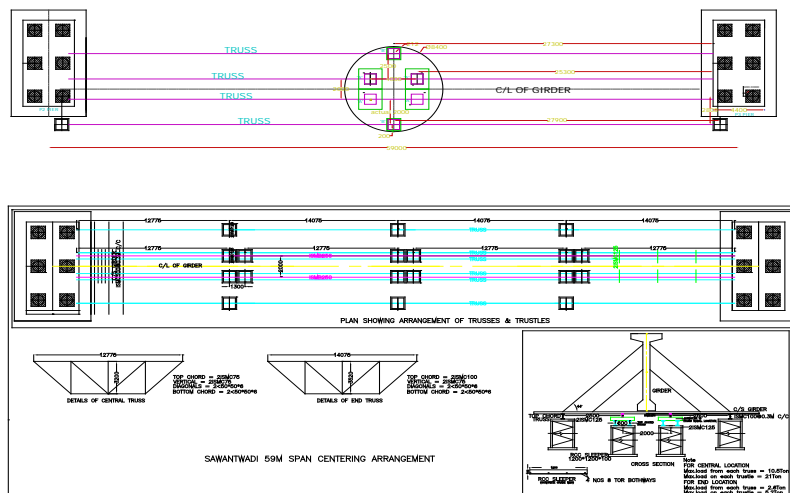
Centering arrangement of unit 2 of Terekhol Bridge
